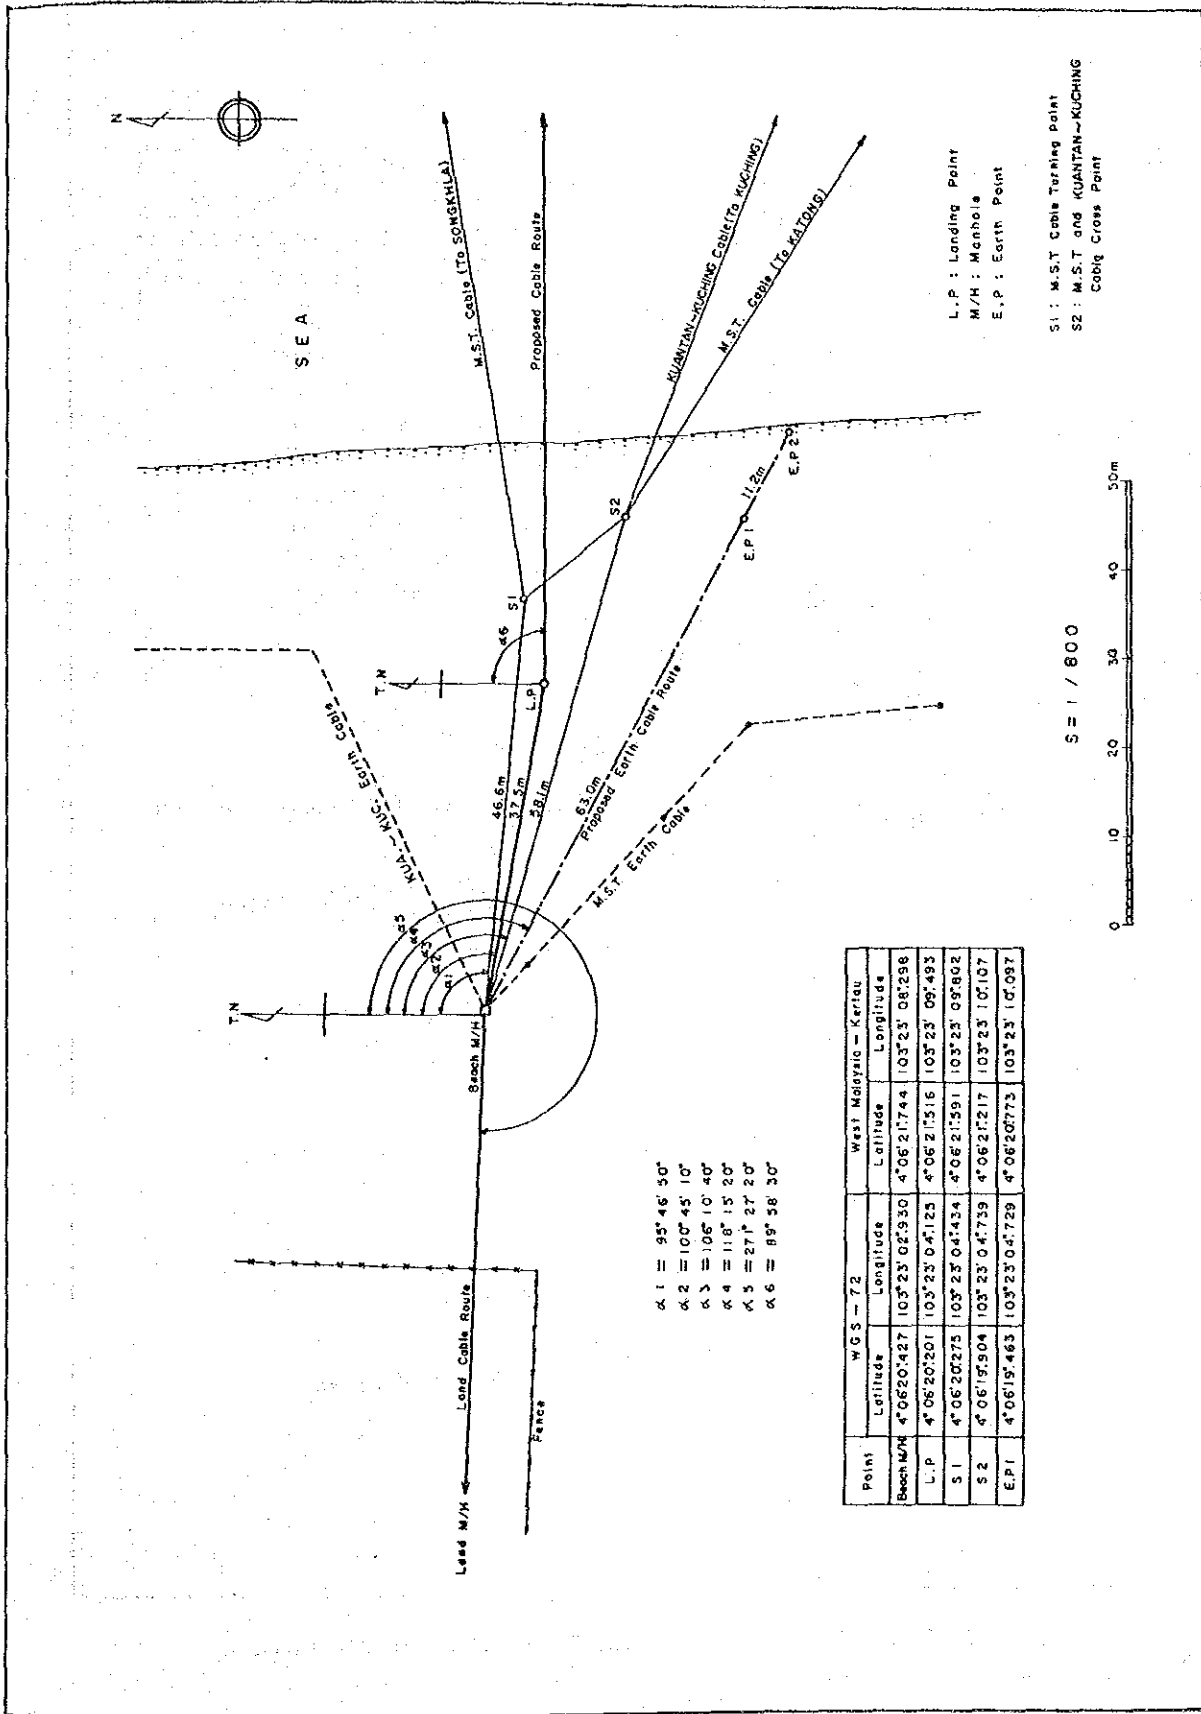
Detailed Location of Existing and Proposed Cable Route in Cherating
